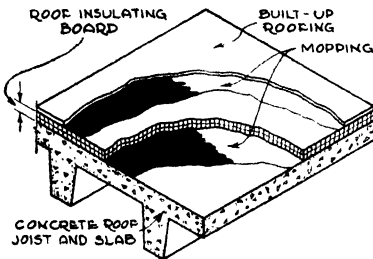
Concrete Roof Deck (Pan Construction), Roof Insulation Board, and Built-up Roofing
